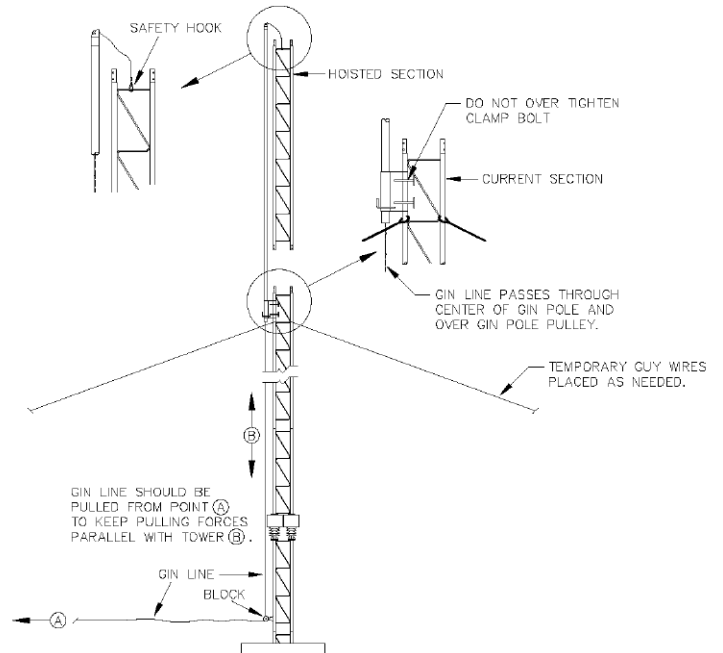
Assembly using erection fixture 2 (included w/ Optional Installation Kit.)
